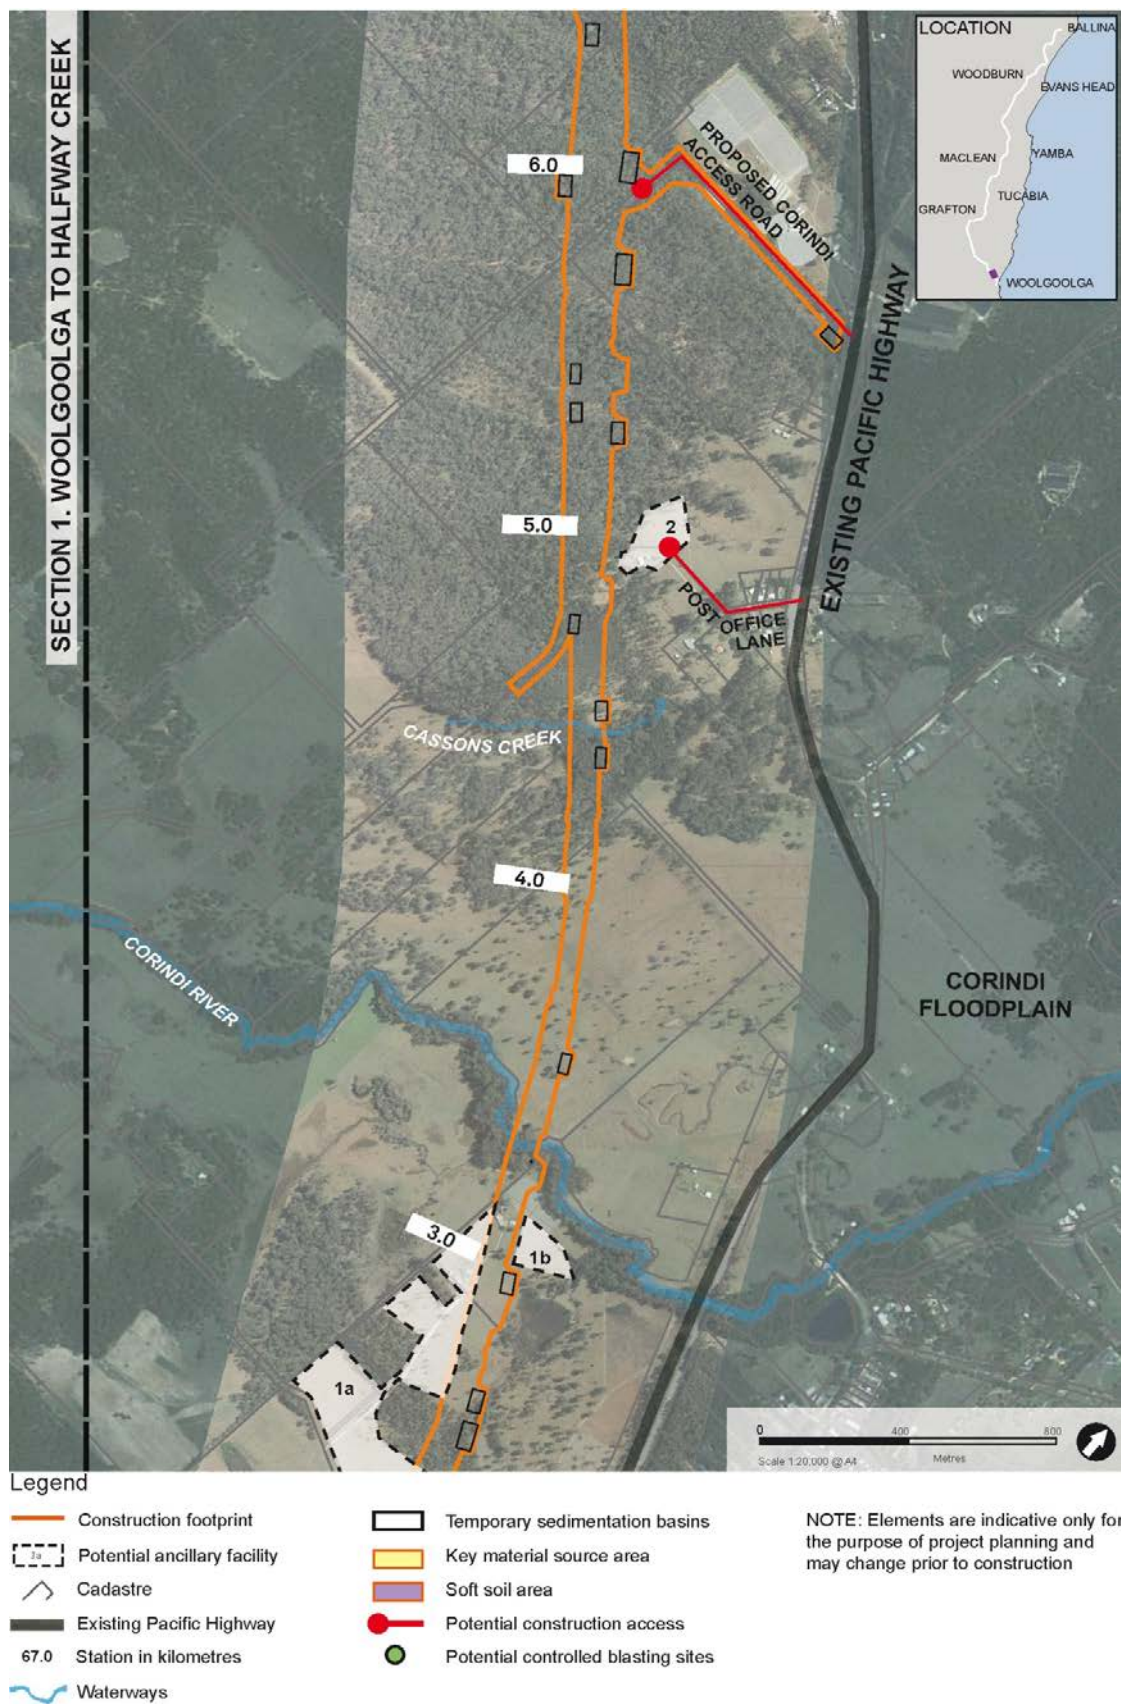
Extent of construction and construction features Section 1 (Station 3.0 to 6.7)
